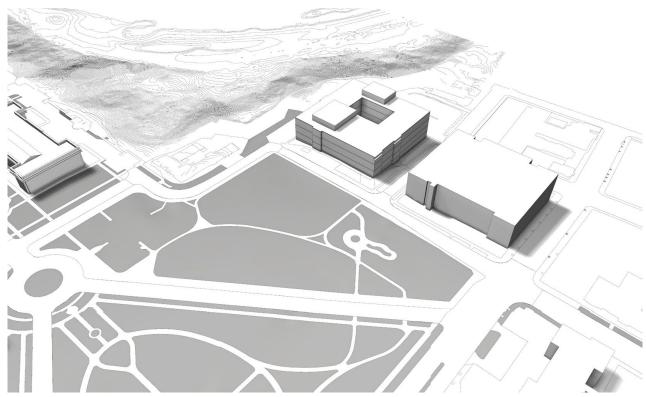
ALTERNATE 1.C: RENOVATE GA BUILDING FOR MULTI-TENANT OFFICE BUILDING
